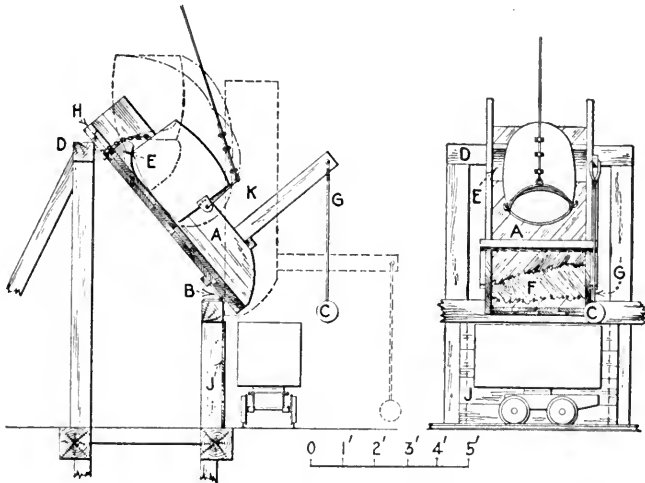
SWINGING CHUTE FOR DISCHARGING BUCKET.
